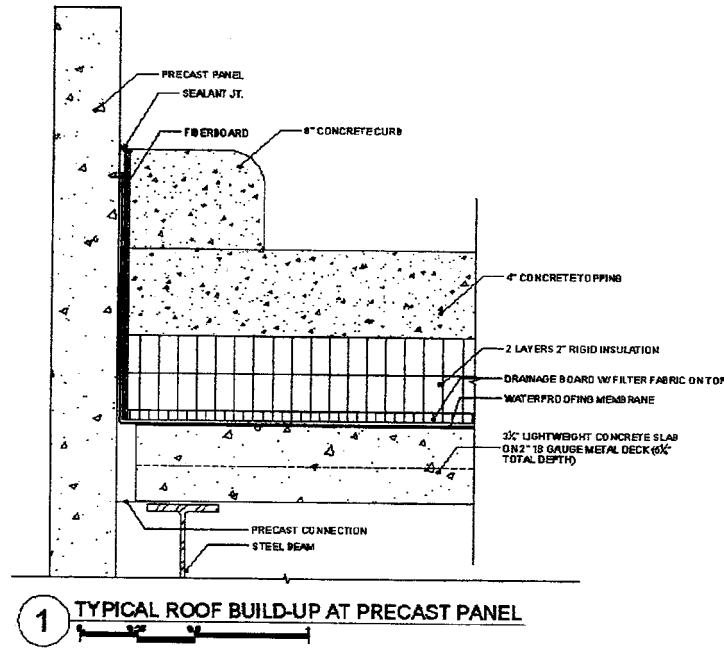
Roof Build-Up as Observed by WJE at Precast Panel
